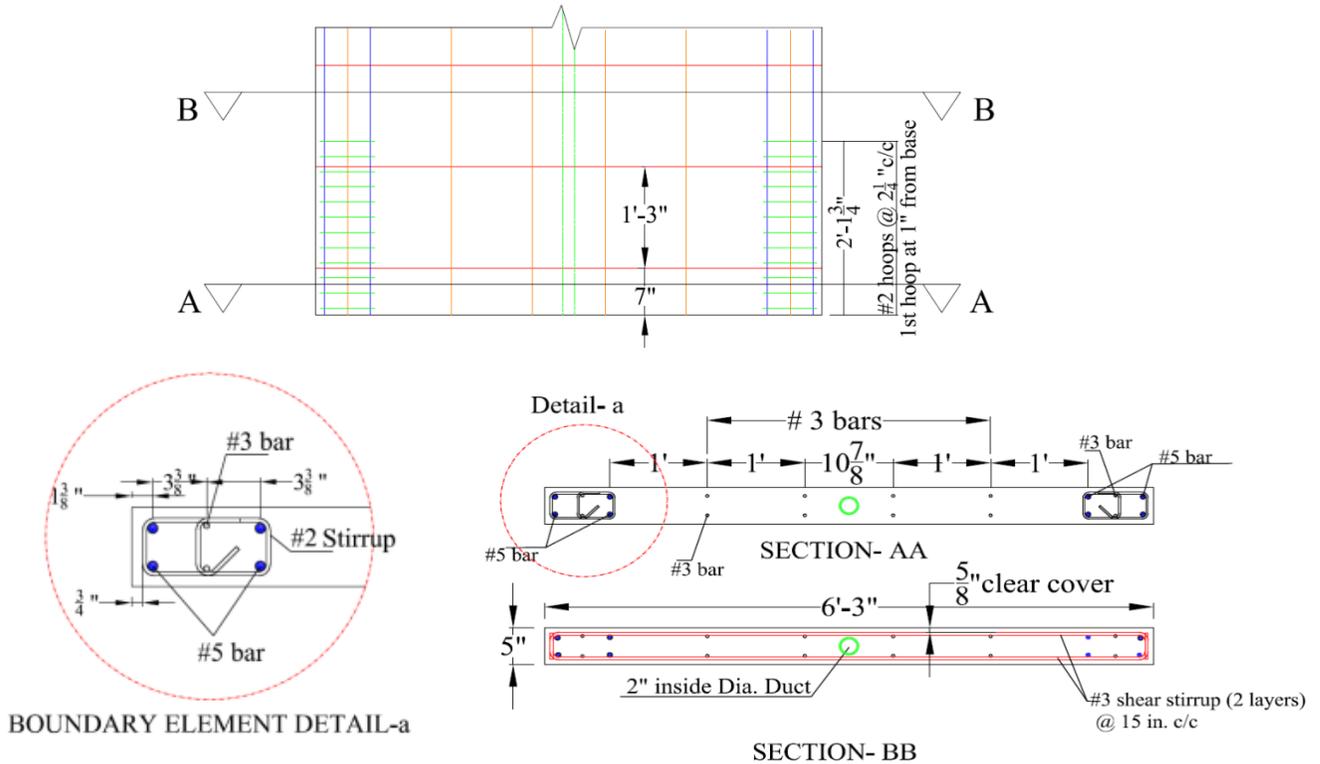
Typical cross-sectional details of all four walls (SRW1-4)
